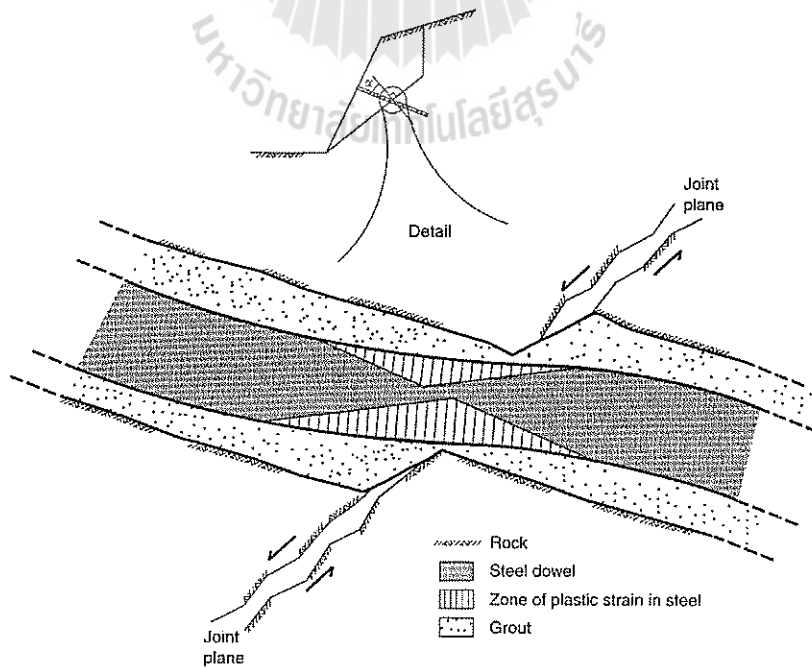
Strain in fully grouted steel dowel due to shear movement along joint (modified from Spang and Egger (1990)).
